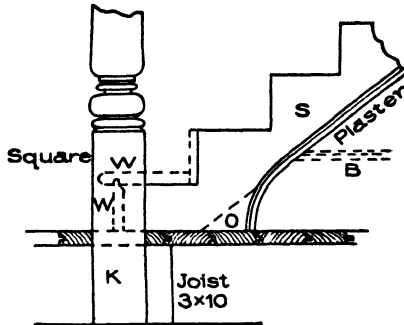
Showing How a Cut or Open String Is Finished at Foot of Stair
